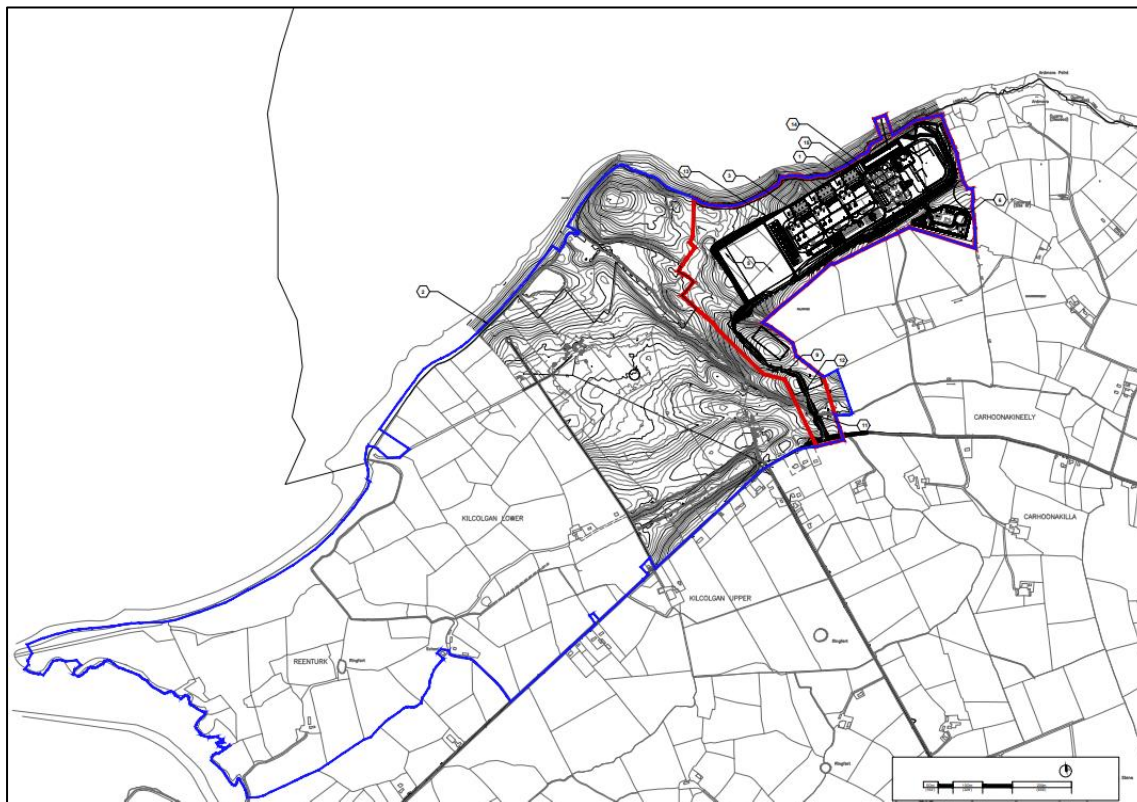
Proposed BESS and Power Plant (Part 1)
